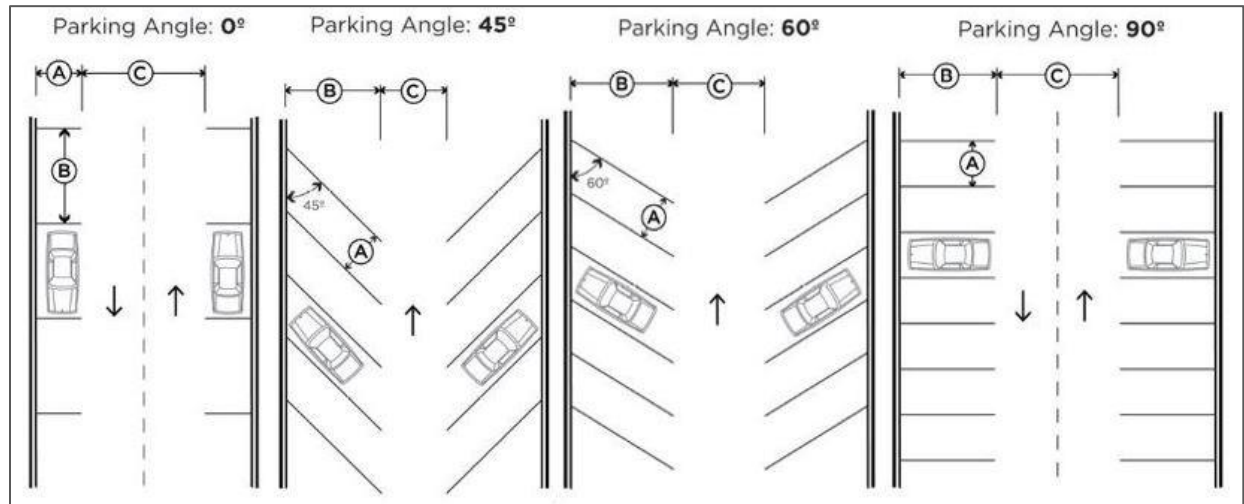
Parking Angle and Stall Width Diagram.
